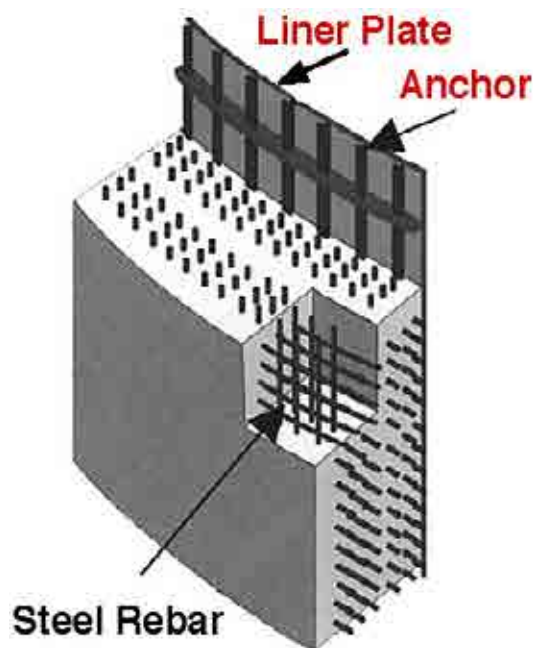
Metallic liner plate adjacent to reinforced concrete.
